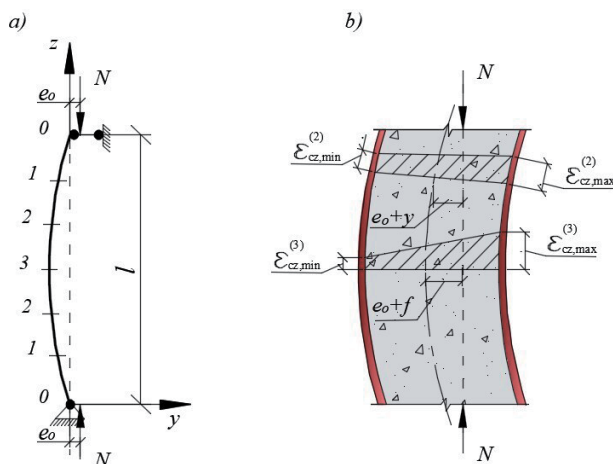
The design scheme of a flexible pipe-concrete column: a - the decomposition of the compressed rod along the length; b - distribution diagrams of concrete relative deformations in Section 2 and 3.
